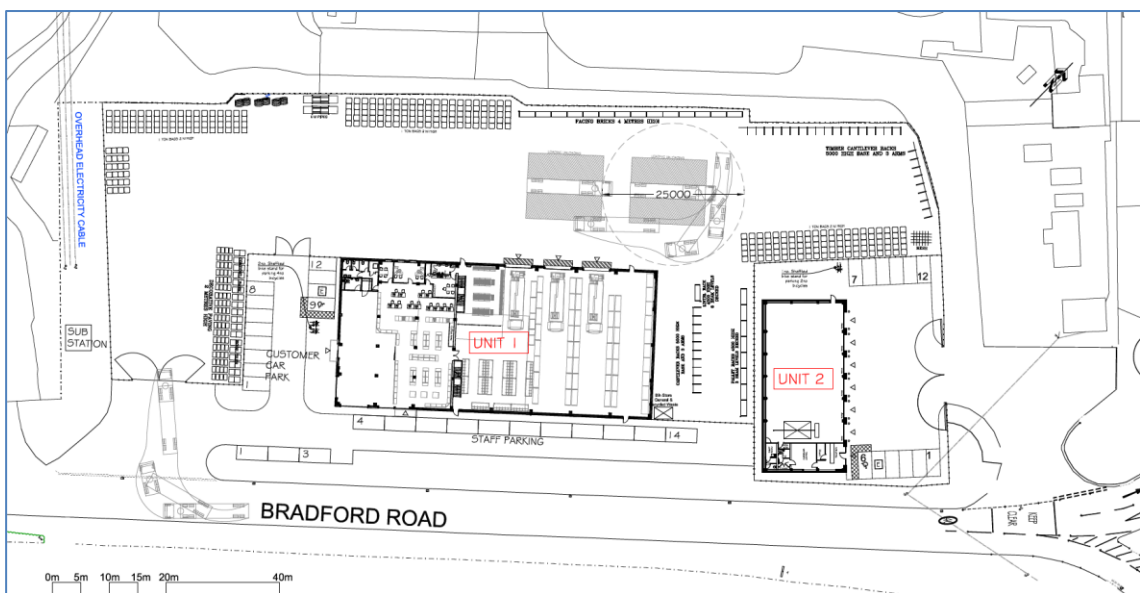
Extract from Proposed Site Plan showing the layout of Units 1 and 2.
